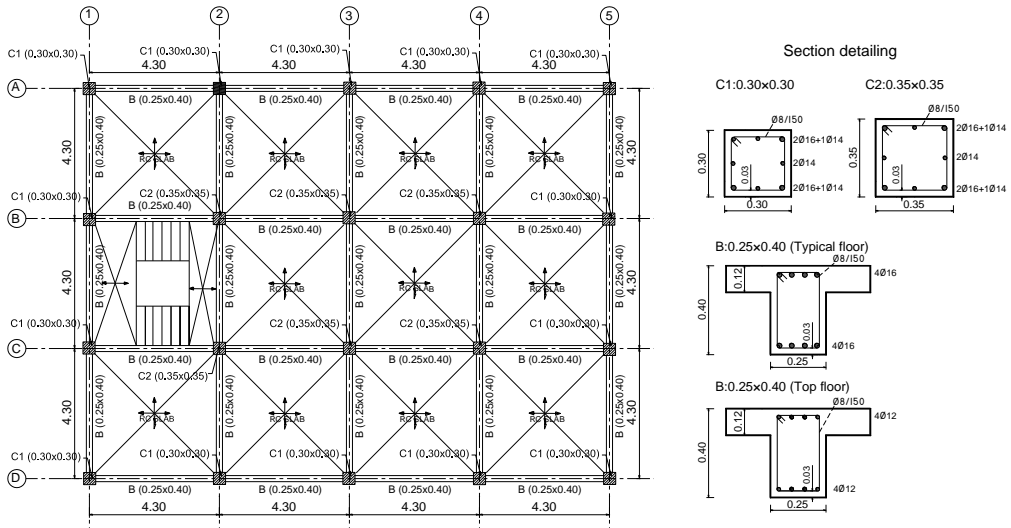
Plan view of a typical story of the 3-R, 4-R and 5-R buildings and design details.
